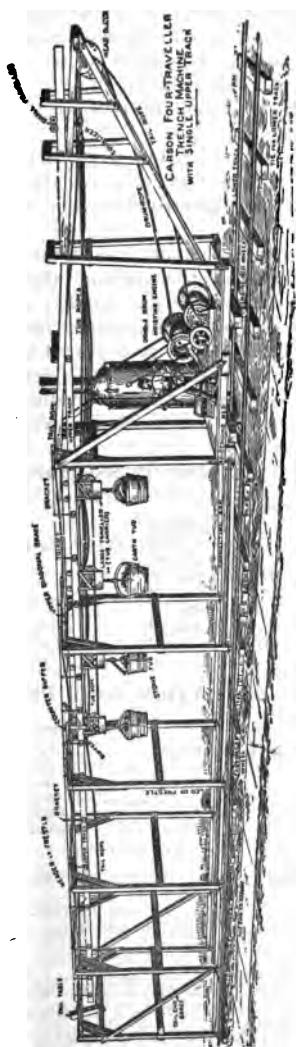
Carson Four Traveller Machine, with Single Upper Track.
